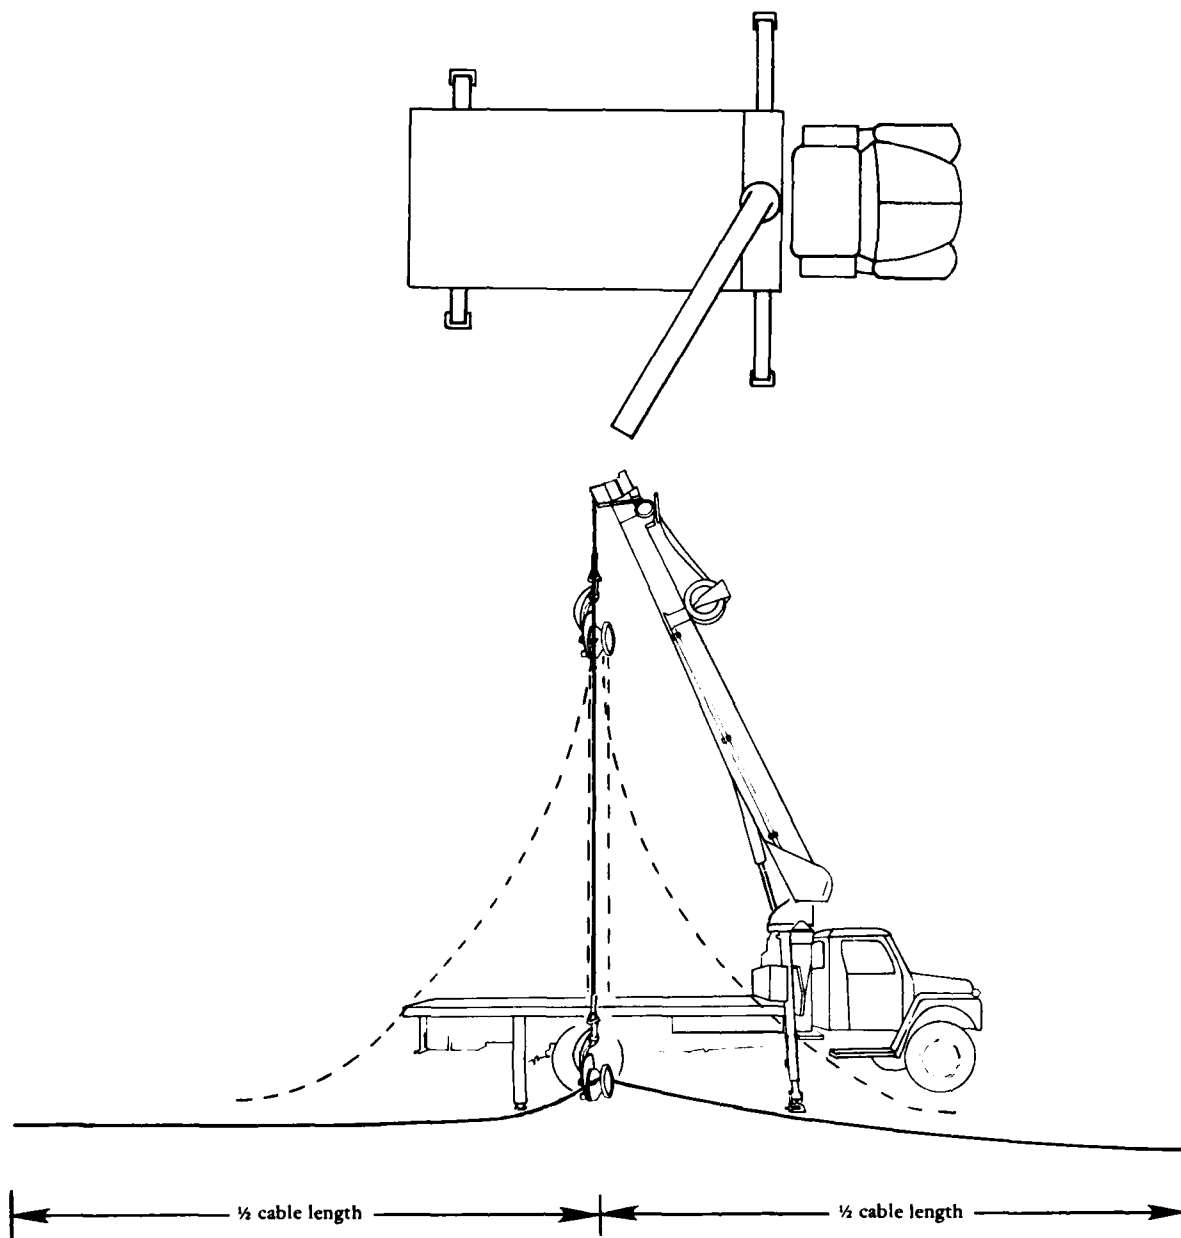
Picking up cables from pier (prior to loading on truck).
